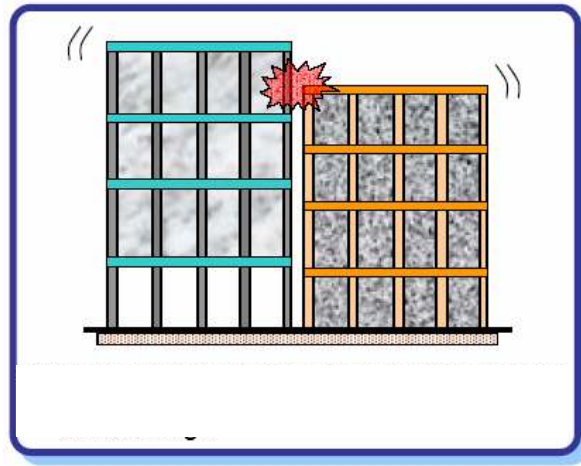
Pounding can occur between adjoining buildings due to horizontal vibrations of the two buildings.
